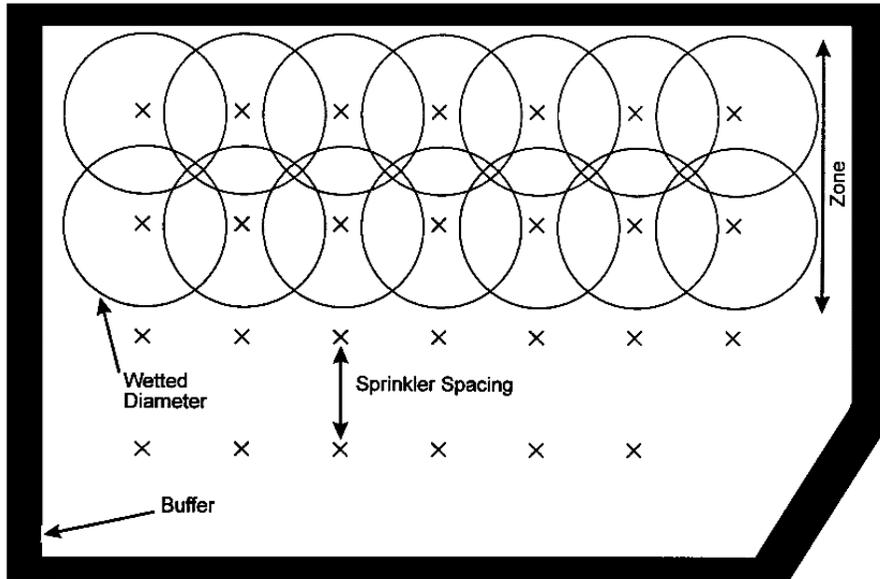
Typical layout of a stationary sprinkler system. Sprinkler spacing is typically 50 to 65% of wetted diameter.
